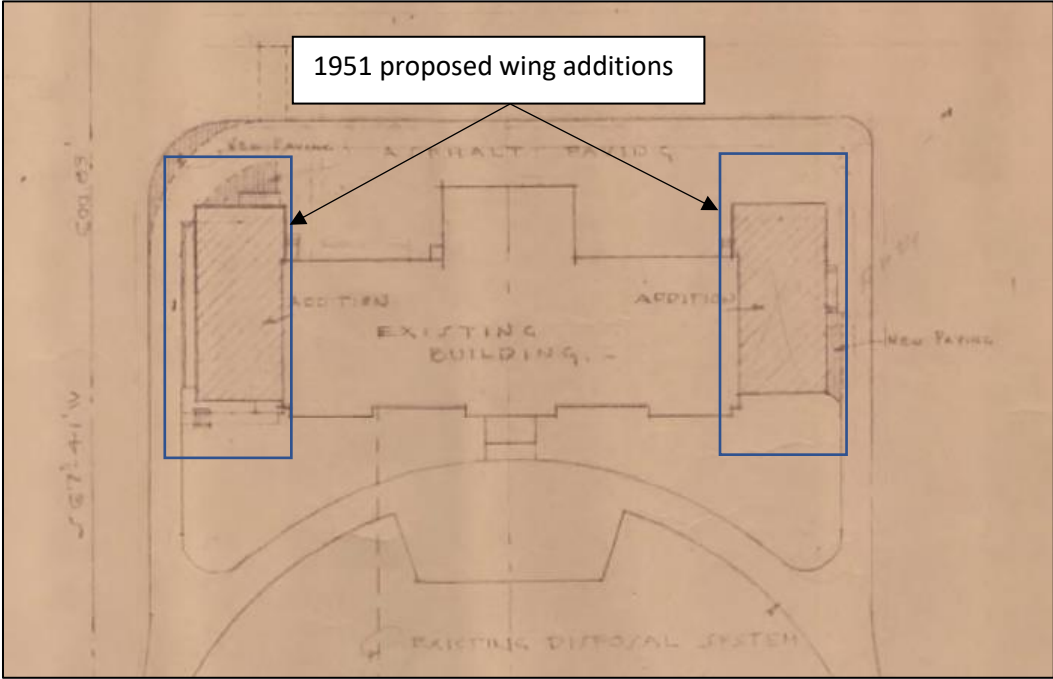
Architectural drawings of James G. Ludwig office, plot plan, alterations, and additions to the East Whiteland Consolidated School, 1951. (provided by Great Valley School District)
